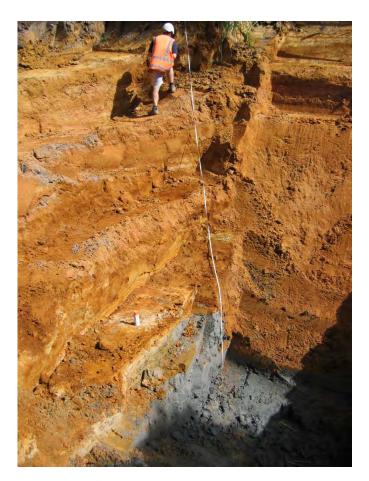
Excavation to beneath weathering zone for shear key on Northern Gateway Toll Road project
